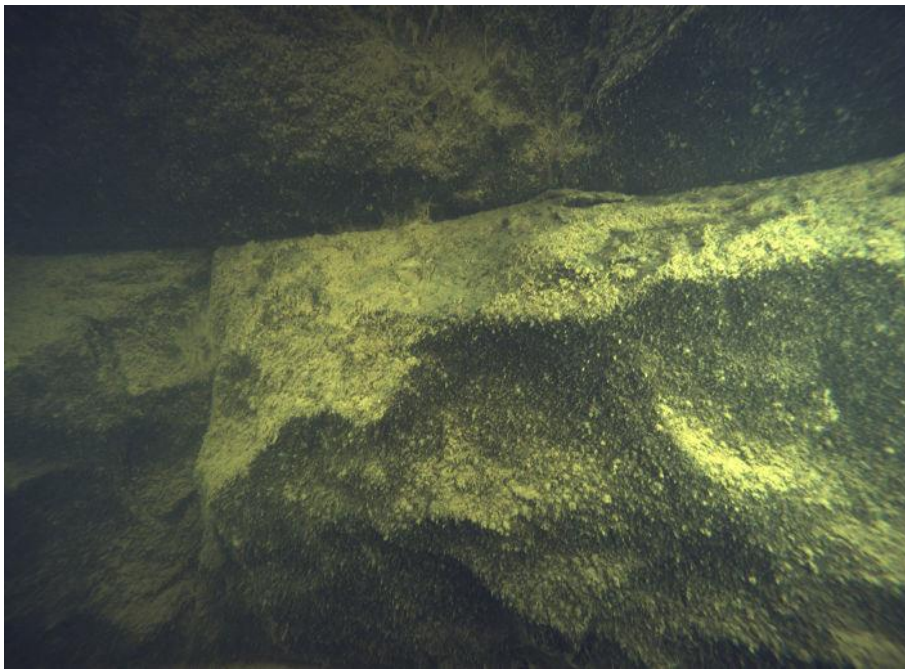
Example of stone blockwork at maximum depth near the centre of the dam wall. The blockwork was found to be intact with no signs of major cracking observed. Grouting appeared to be in place with no instances of missing grout identified.
